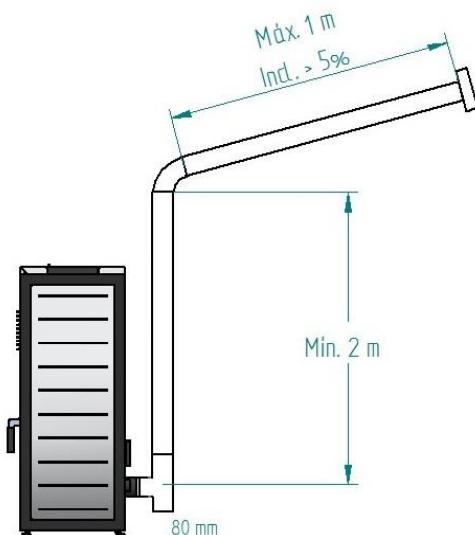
Side view of the installation without a chimney, illustrating the inspection point
